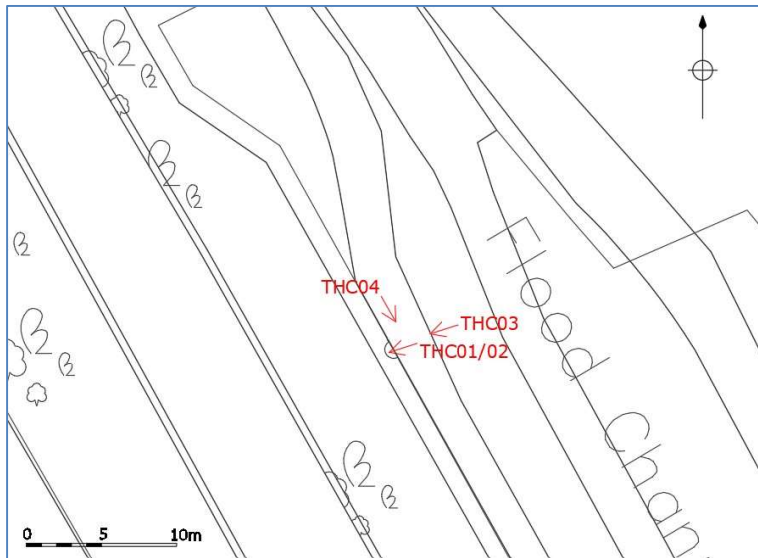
Photographic archive plan for Toad Hall Culvert watching brief.
